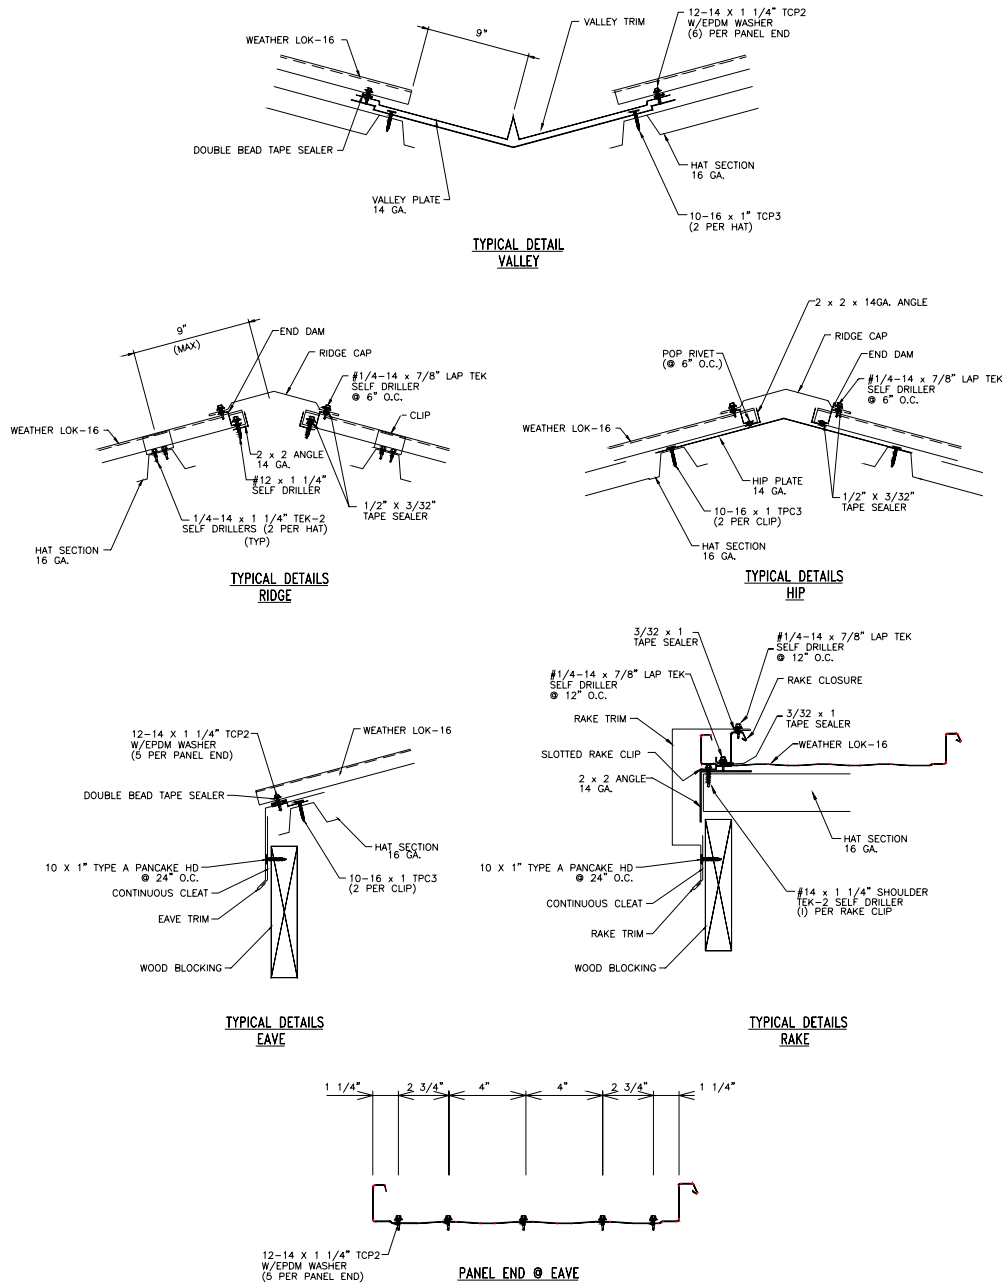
Weather Lok Panel Installation Over 16 Gauge (Hat) Purlins - Details
